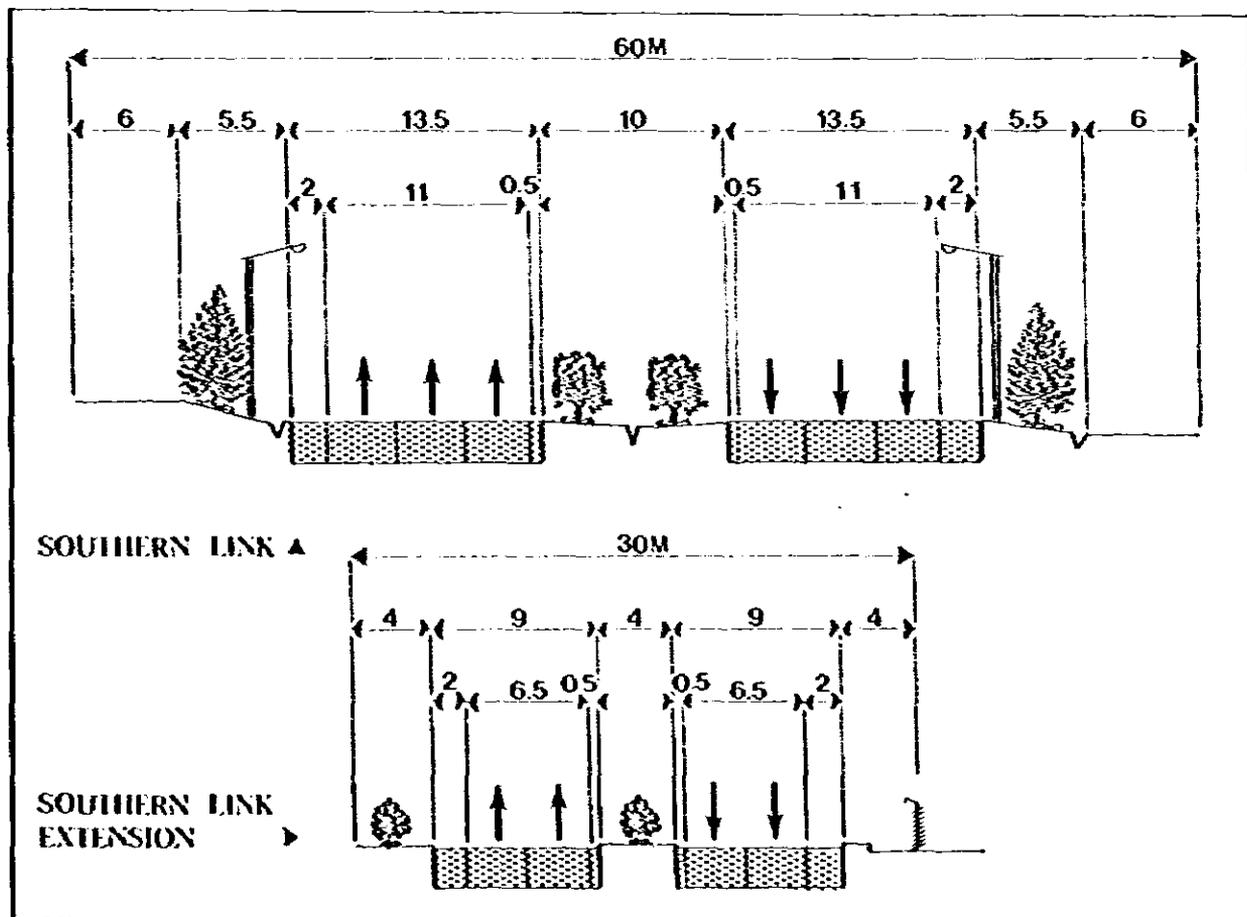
TYPICAL CROSS SECTION (ULTIMATE PLAN): SOUTHERN LINK AND ITS EXTENSION
